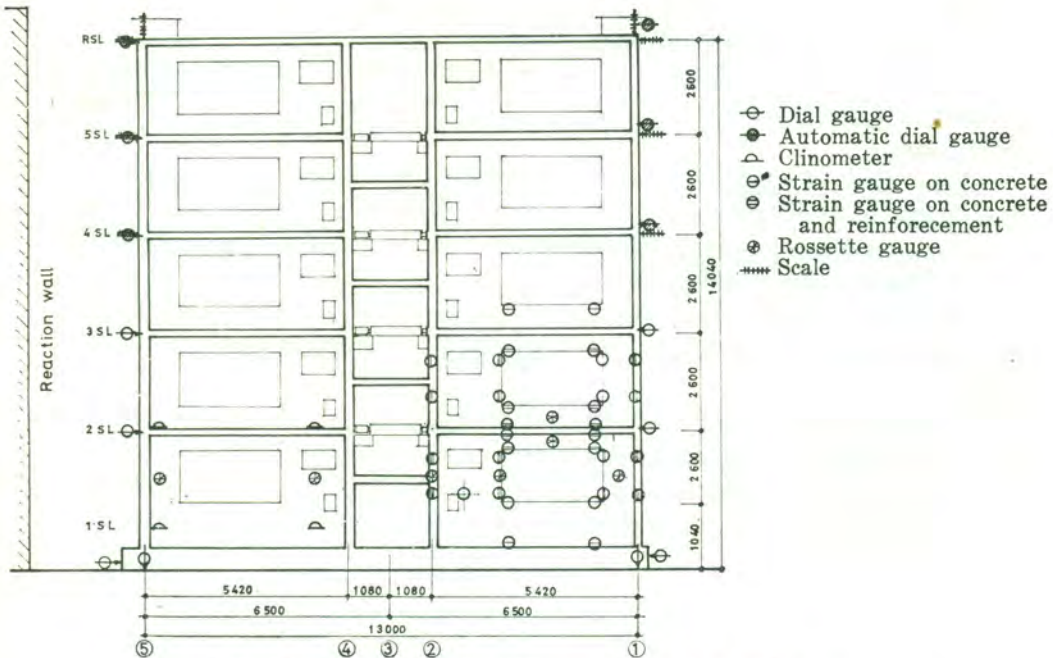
Elevation and positions of apparatus (C-frame)
